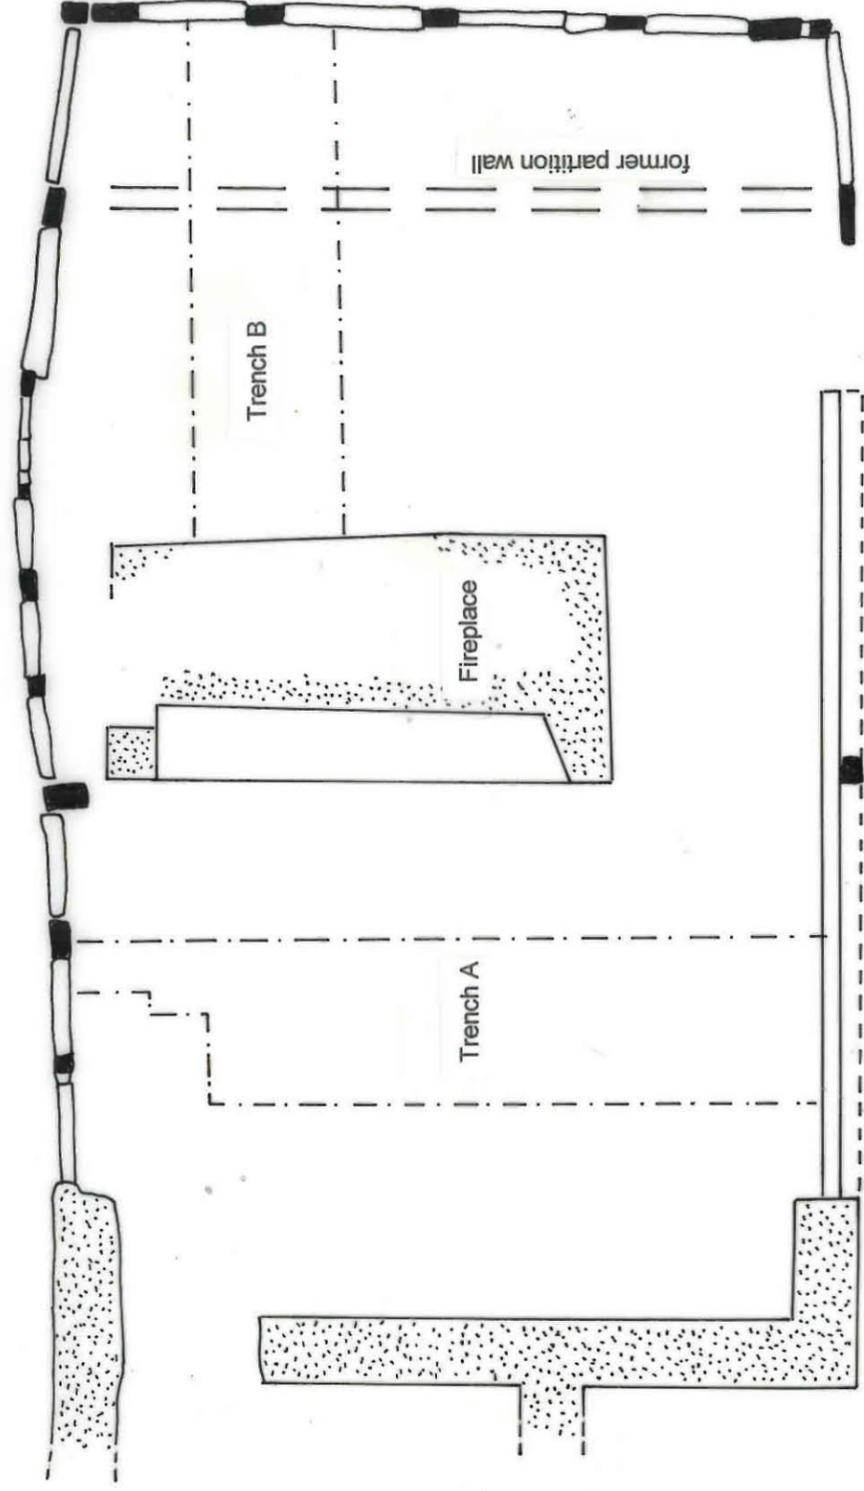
Sketch Plan of Wyddfid Tenement:1778: N.T.S.
